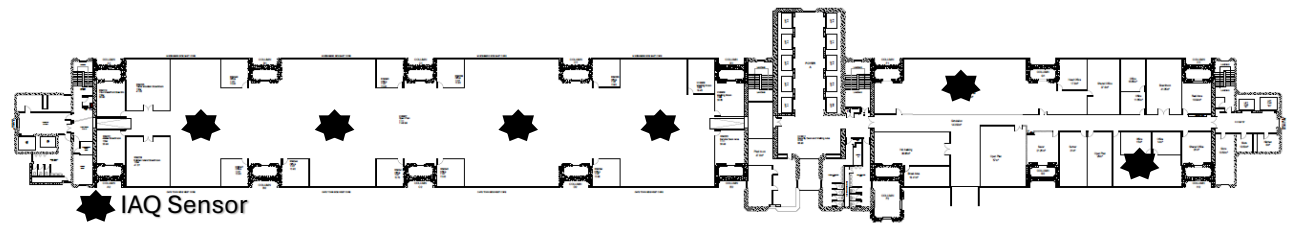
Tower Building proposed sensor positioning 4th floor (6)
